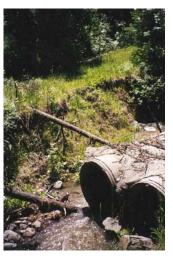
Middle culvert site where standard engineering techniques would be beneficial
